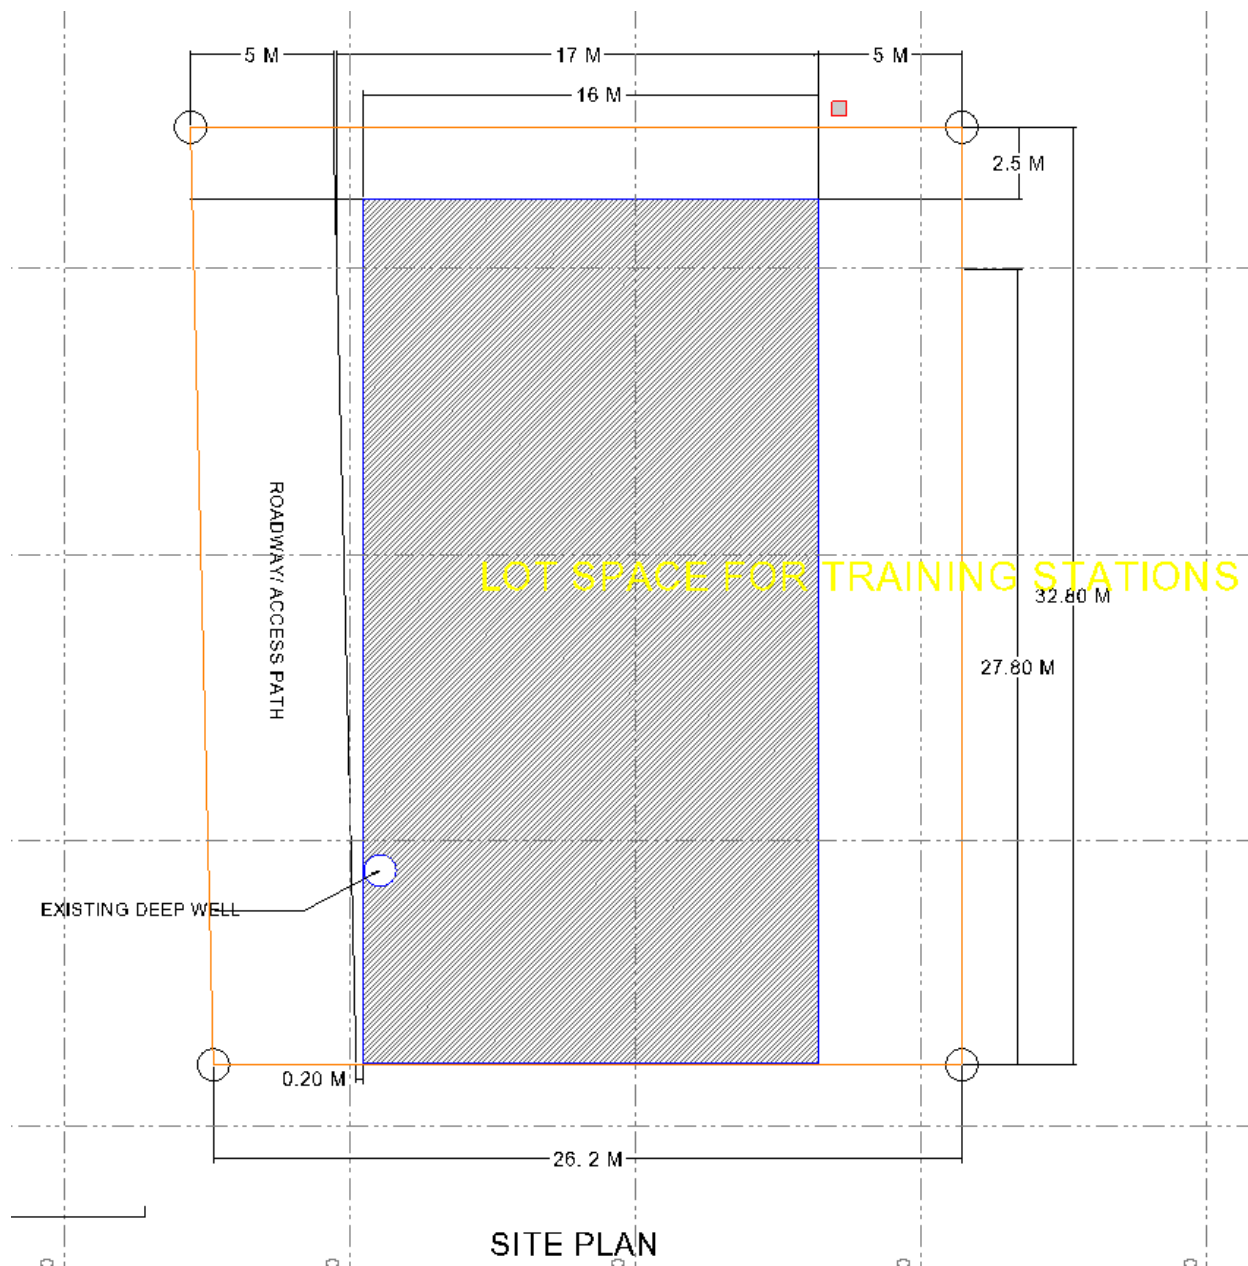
This is the general site plan dimensions that were given to me by Gilbert to begin working on a site layout. The usable space for the Training Facility would be a 16 meter by 30.3 meter lot.
